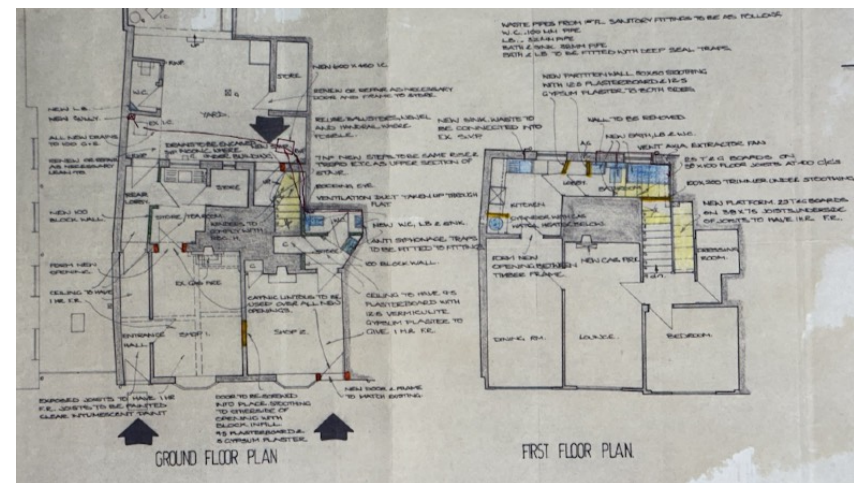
1979 floor plans showing proposed works undertaken in 1980.
